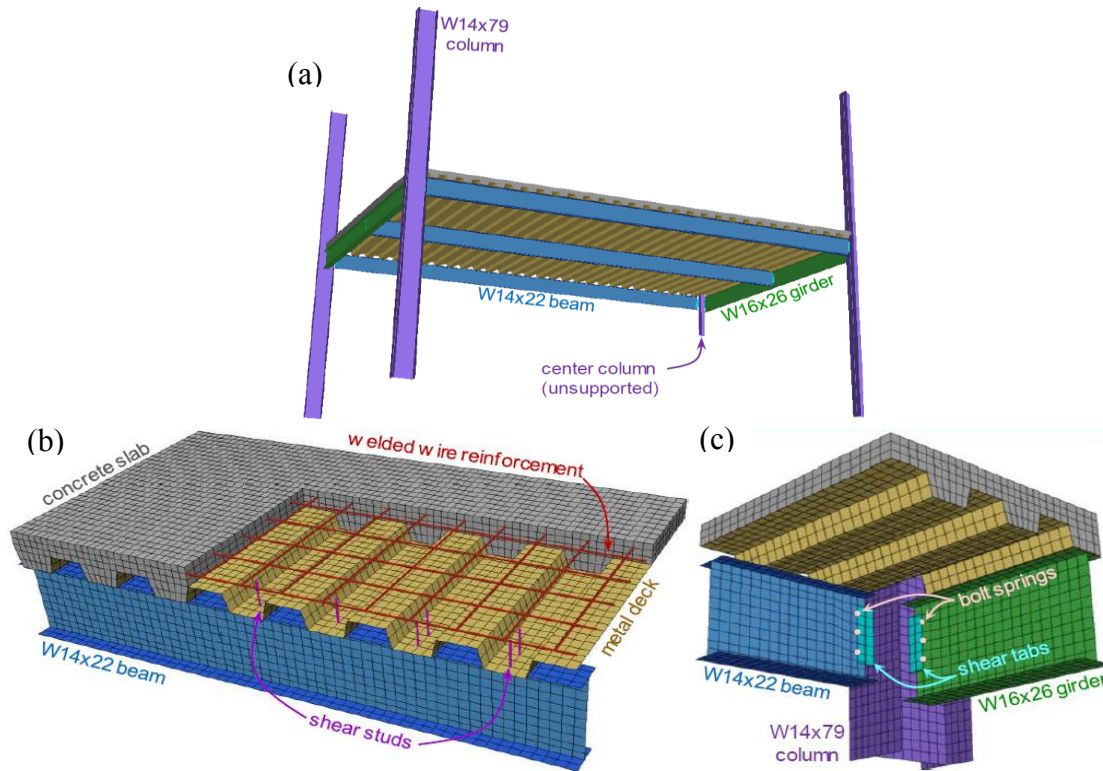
Detailed LS-DYNA models: (a) detailed model of composite floor system; (b) composite floor slab; (c) beam-to-column connections. (From Main and Sadek (2012))
